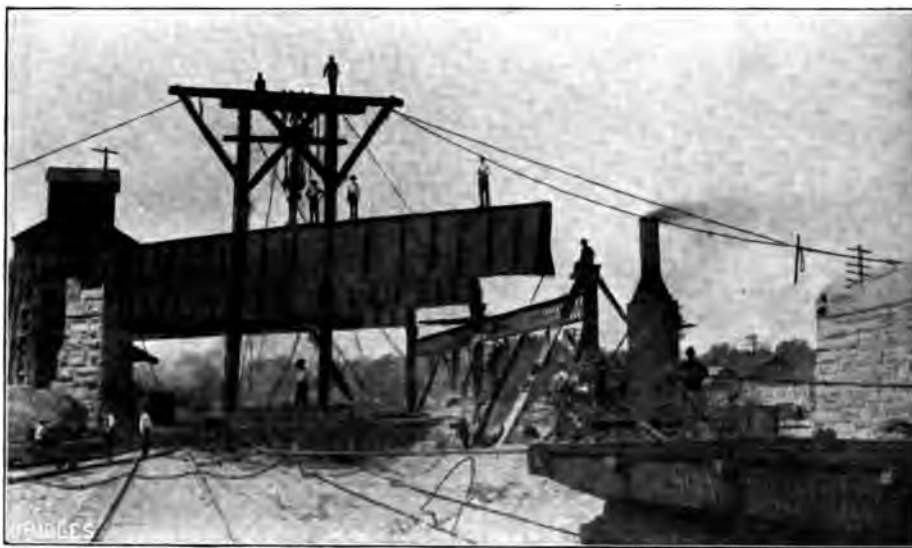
GIRDER BEING RAISED AND LOWERED INTO POSITION.
